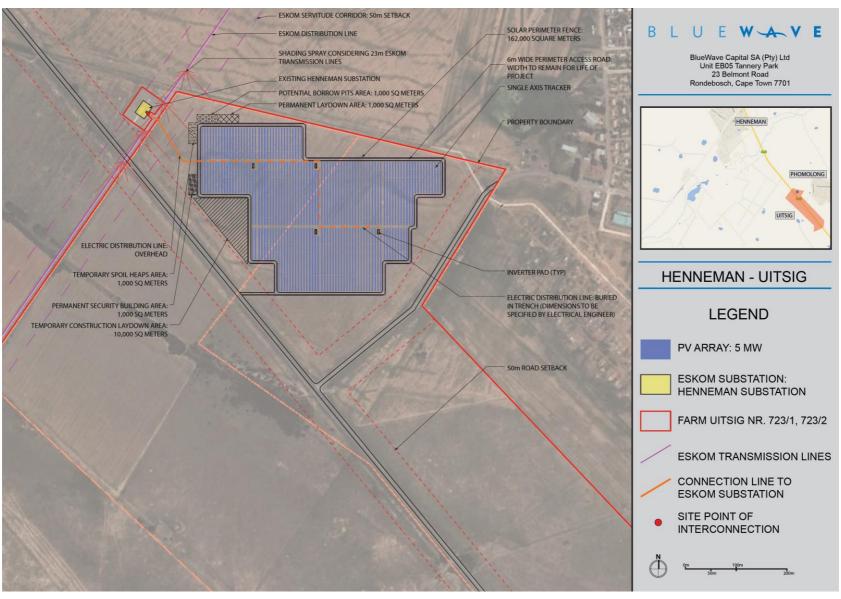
Layout plan within preferred site alternative (site alternative 1)
